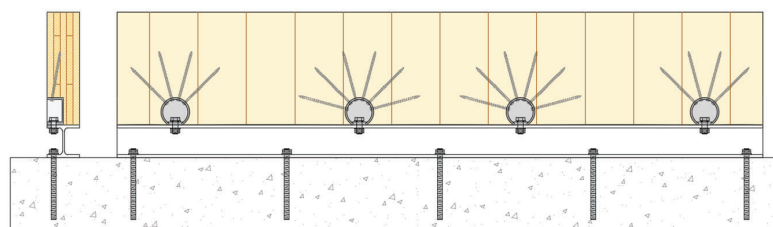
RING90C adopted as hold-down and angular bracket for typical wall-to-foundation connection
